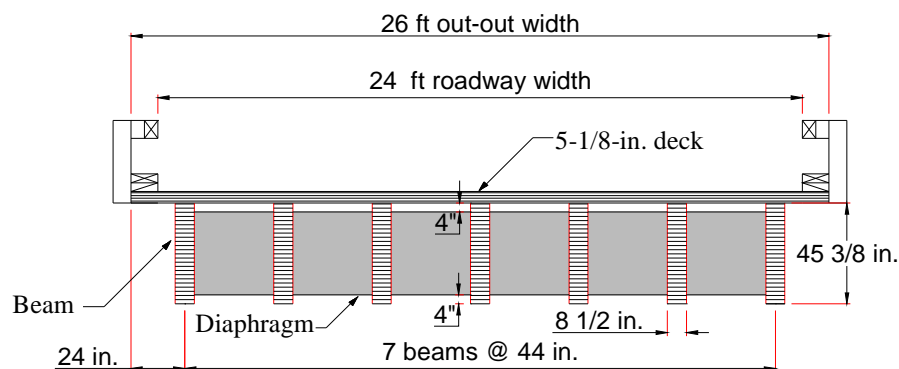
Beam Configuration and Size – 24-ft Roadway Width
